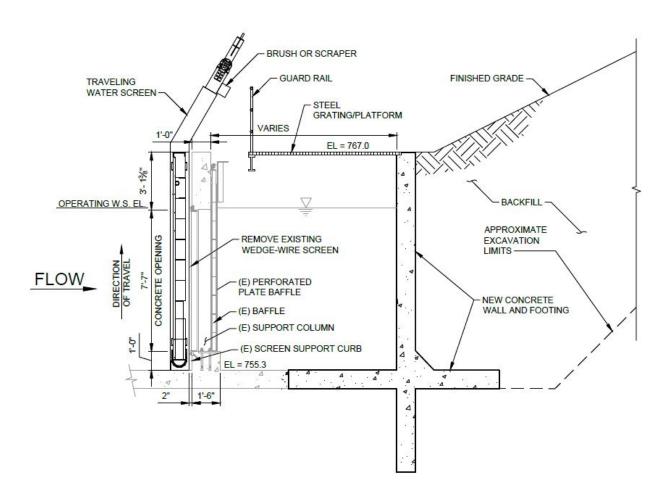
Traveling Water Screens at the Robles Diversion – Section View
